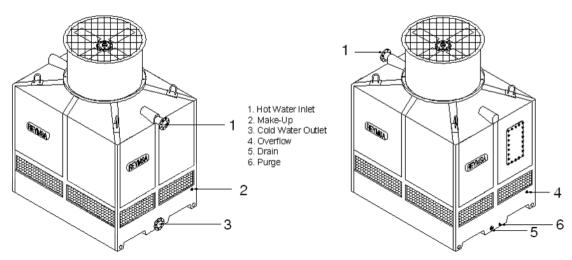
Single Fan Cooling Tower - Pipe Connections
